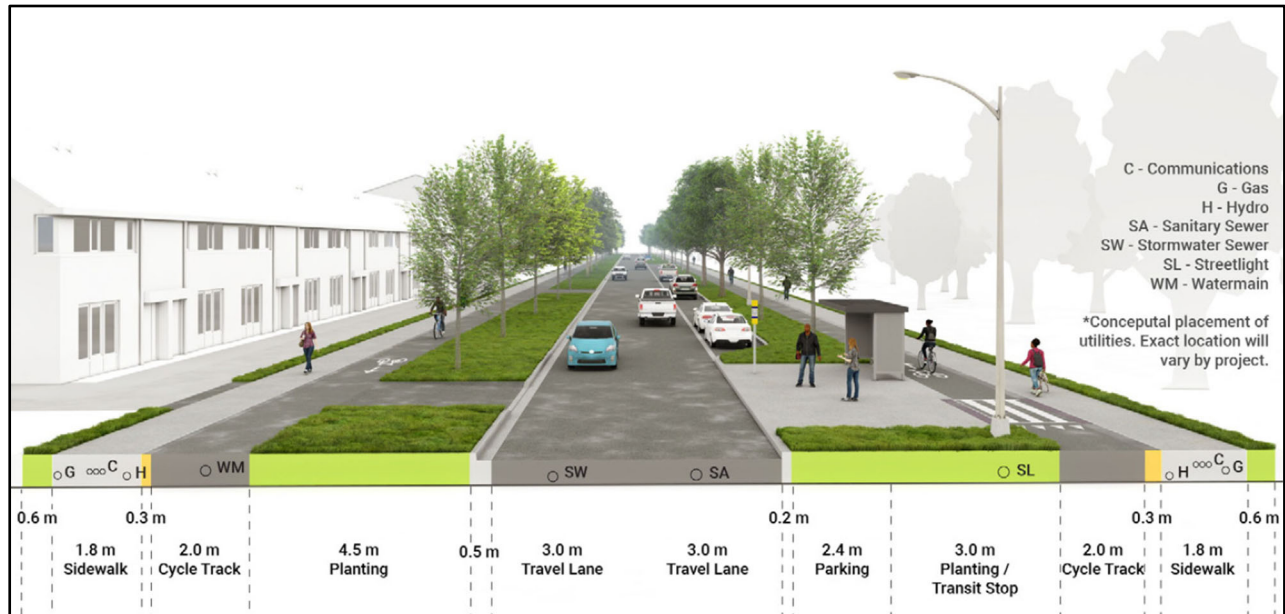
20 m ROW Urban Avenue Typical Cross-Section Design
